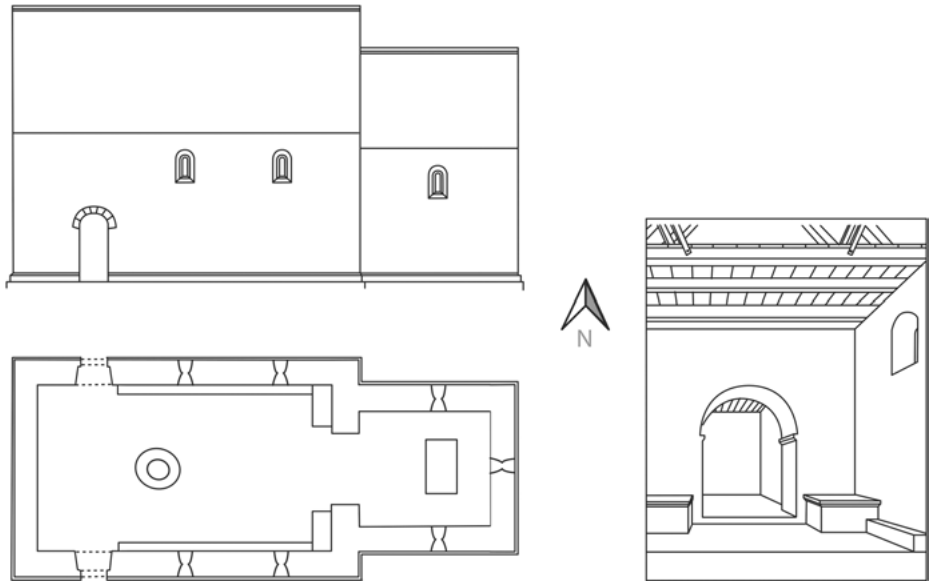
The “minimum church model:” plan, elevation, and cross-section facing East. Based on schematic drawings from *Danmarks Kirker*. Altered by the author and digitized by Kim Bonde, 2019.
